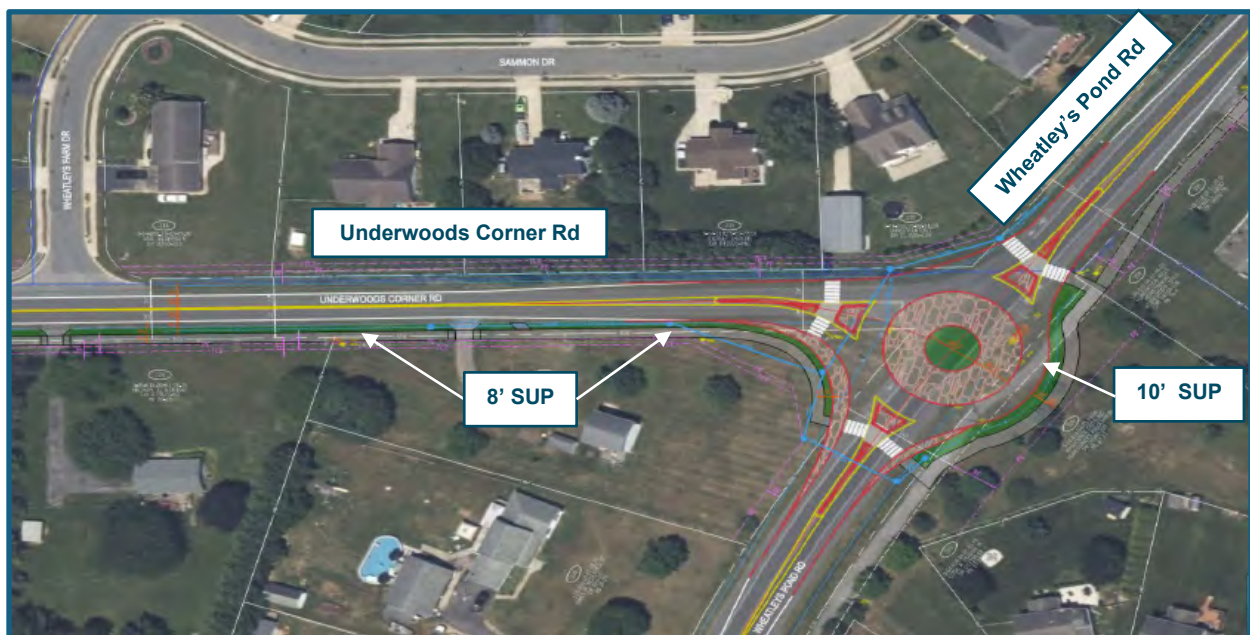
Intersection at Wheatley's Pond Road and Underwoods Corner Road – Roundabout
